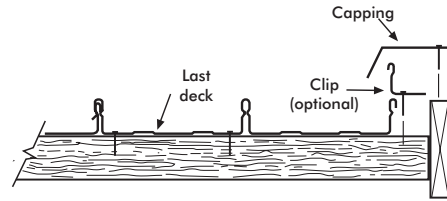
C Cappings on a Snaplok™ 406 Roof
